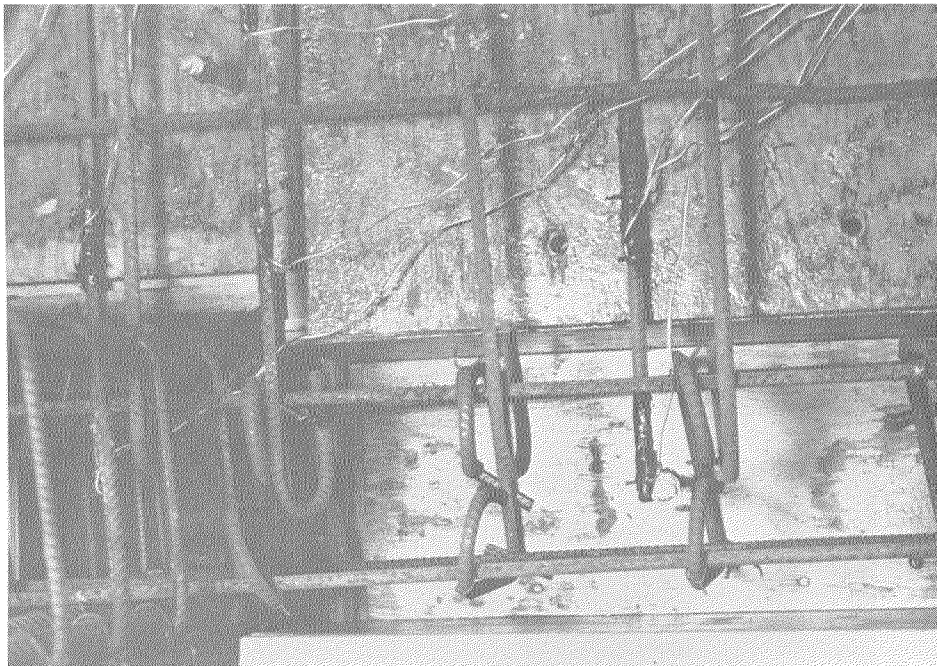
Reinforcement Detail of Spandrel Beam in DNY_4
